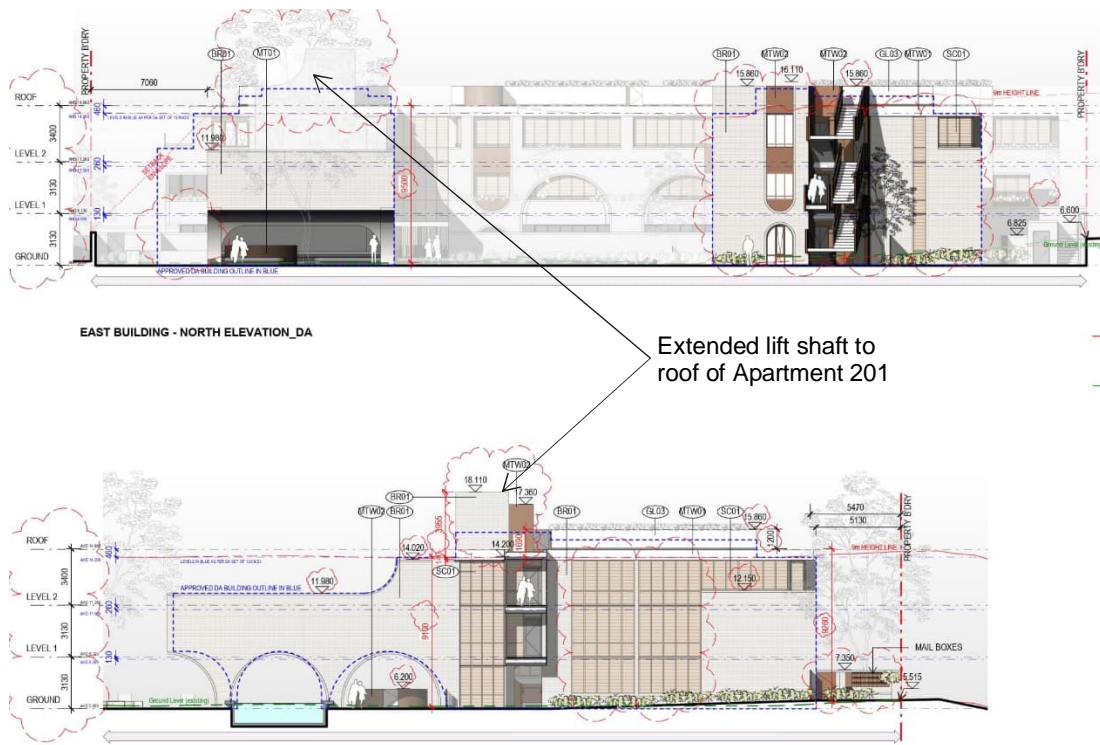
Change Drawings – East Building, north & west elevation (Hayball Architects)
